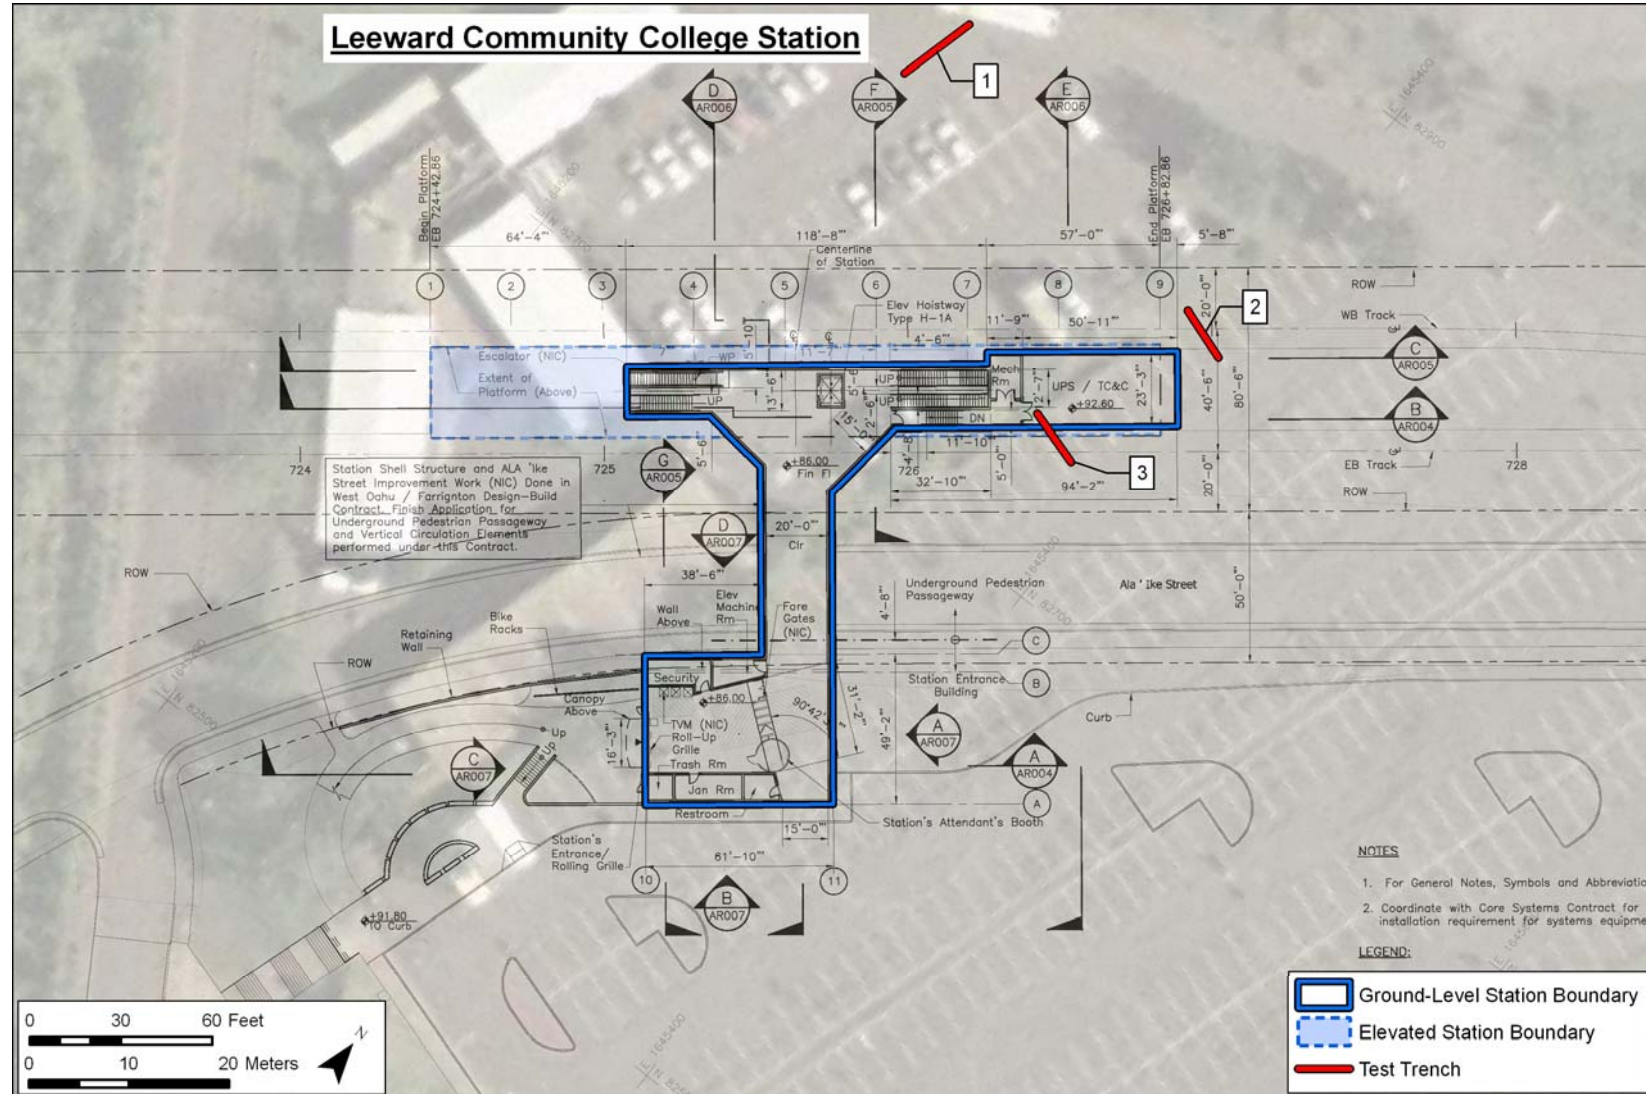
Leeward Community College Station floor plan showing the location of test trenches
